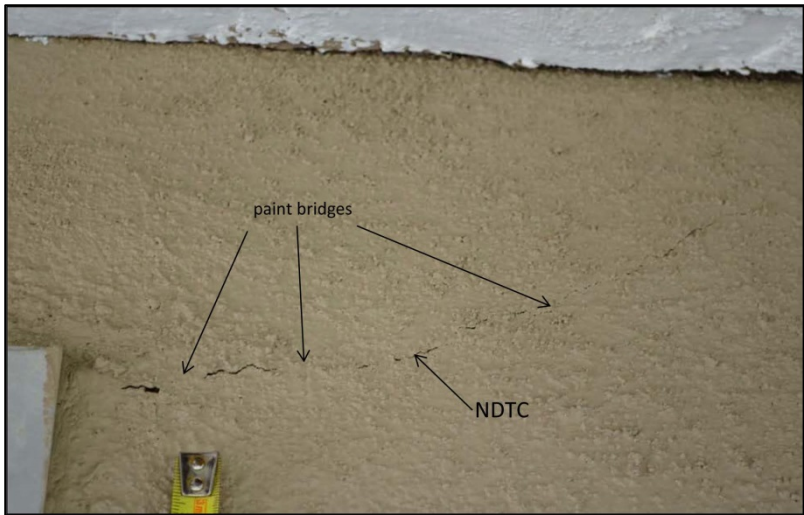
An NDTC-type wall crack in stucco with paint bridges.
